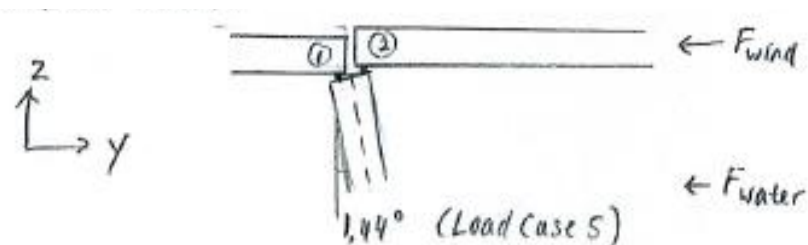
LOAD CASE WITH WIND AND WATER LOAD IN THE DIRECTION ALONG THE BRIDGE GIRDER
